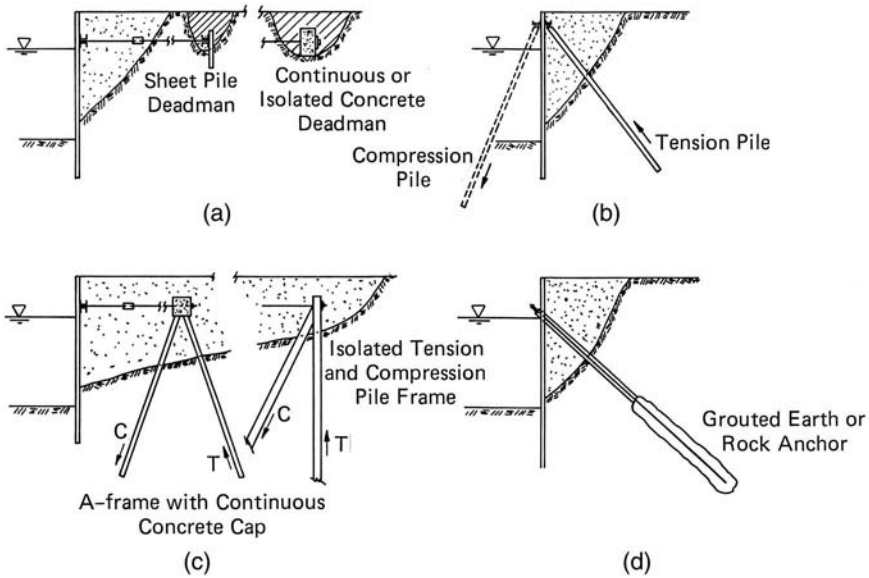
Typical bulkhead anchor system: (a) tie-rods and deadman; (b) H-pile tension or compression anchor; (c) tie-rods and pile anchors; and (d) drilled grouted anchor
